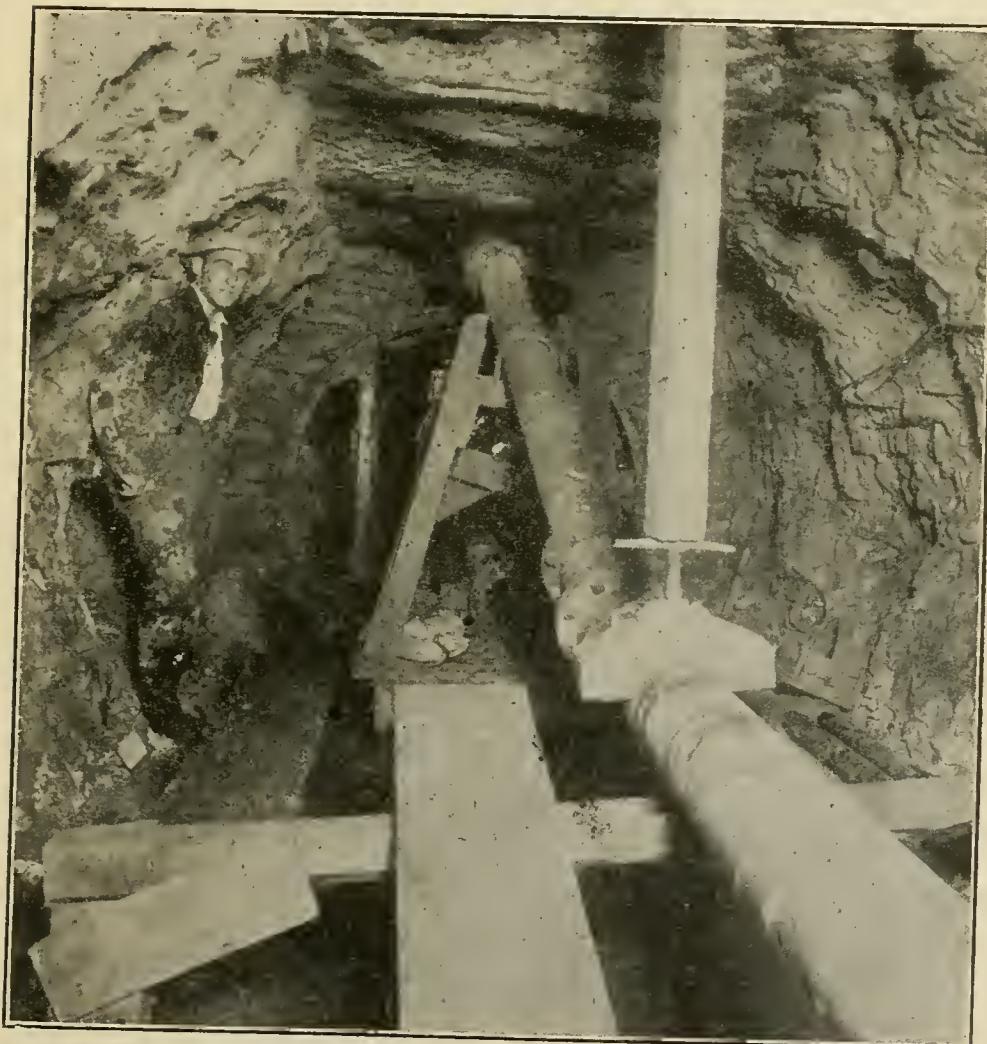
Showing Bracing of Discharge Pipe and Elbow Connections leading to top of arch, also type of Bulkhead used.
